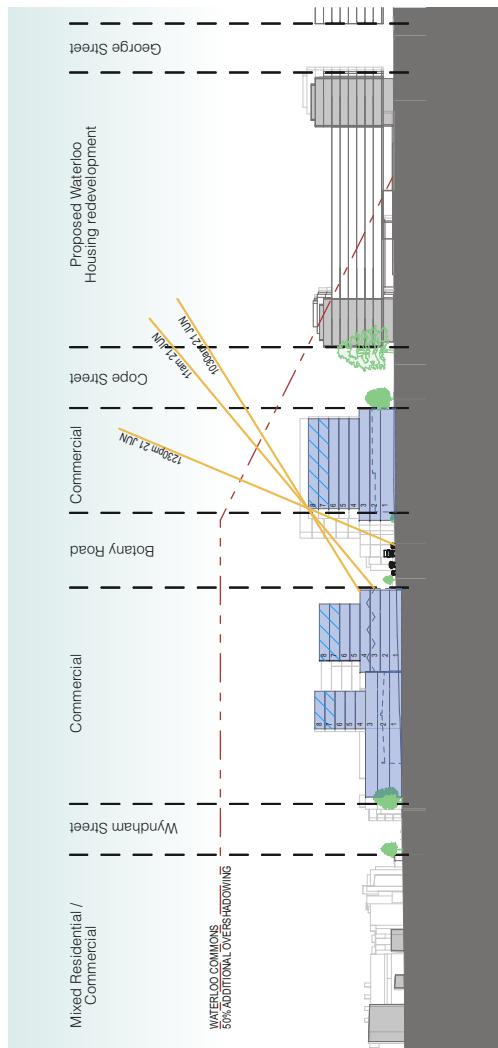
Section 1 - McEvoy Street Quarter, through Wyndham Street, Botany Road and Waterloo Housing redevelopment. Morning solar access.
